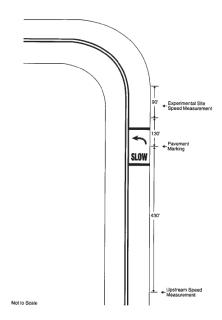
Illustration. Horizontal curve warning and speed advisory pavement marking (Retting and Farmer 1998).
